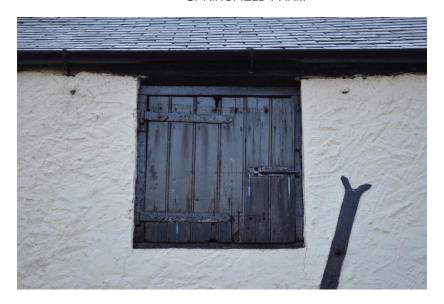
Upper Window with Wooden Shutter on North West Elevation
